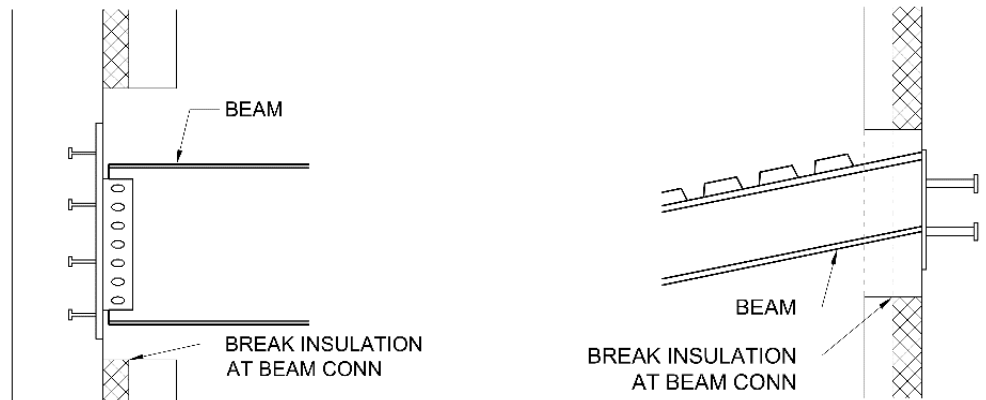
Sample details of structural penetrations of insulation resulting in significant thermal bridging- insulation is often replaced around the structural element, but thermal bridging still typically occurs through the element itself
